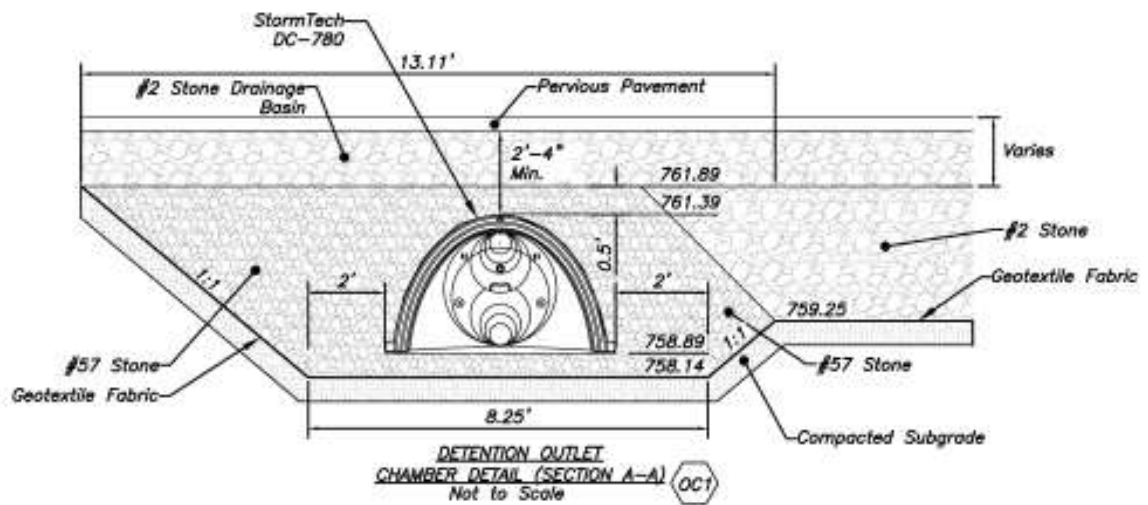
Section view of Tech South permeable pavement with detention and outlet structure
